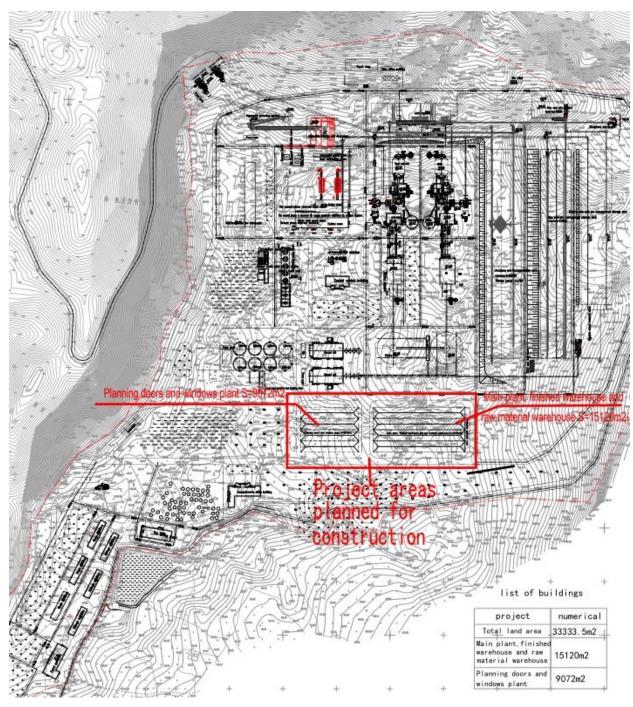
Myanmar Conch (Mandalay) Green Building Materials Co. Ltd General Layout
